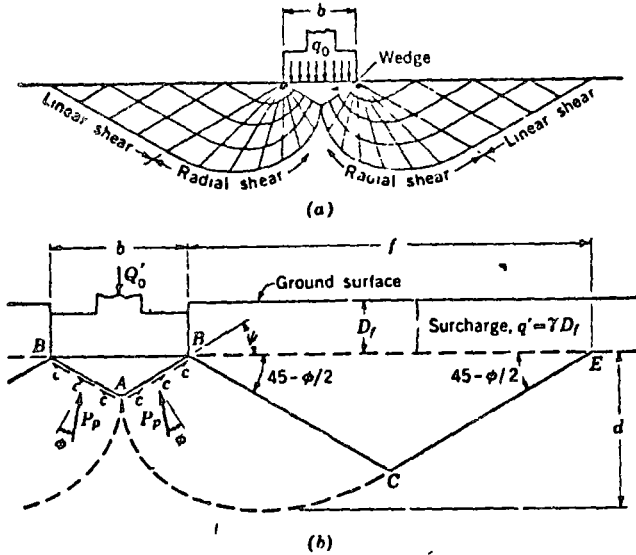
Plastic analysis of bearing capacity. (a) Foundation load and zones of shear; (b) geometry of the shear zones and the forces acting to restrain failure.
